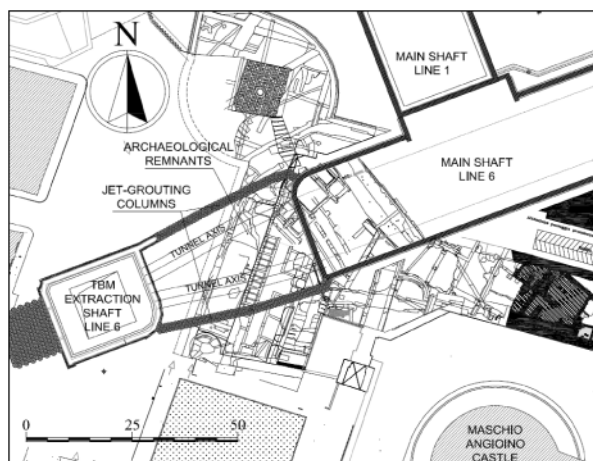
The two connecting tunnels below the ancient remnants, with the lateral jet-grouting barriers.
